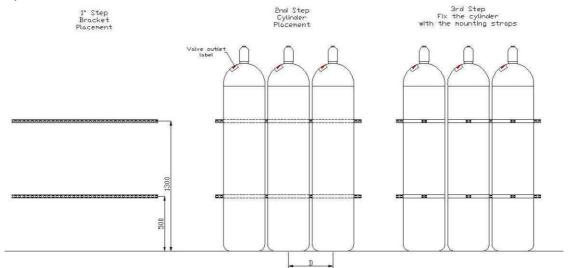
Cylinder fixing – Single-row multi-cylinder system
